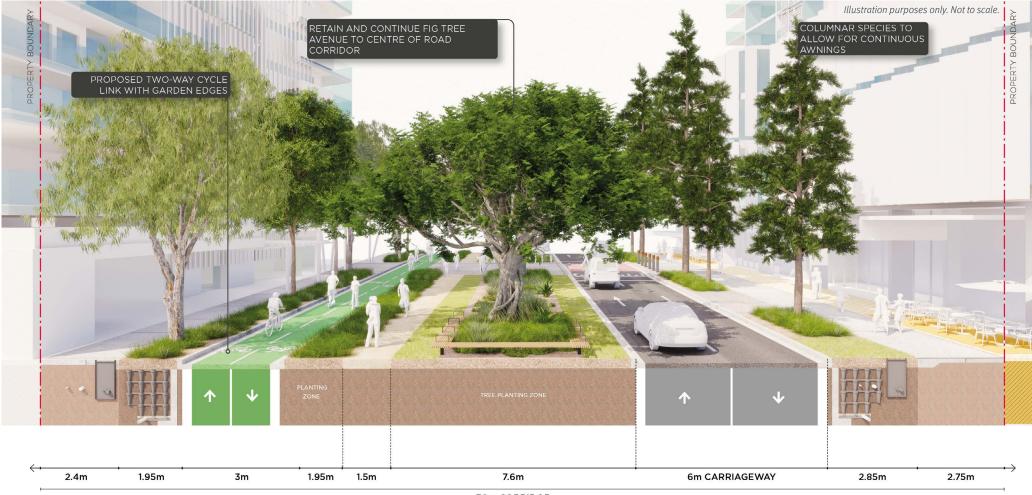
Cross section - Vulture Street - subtropical boulevard (minor)
